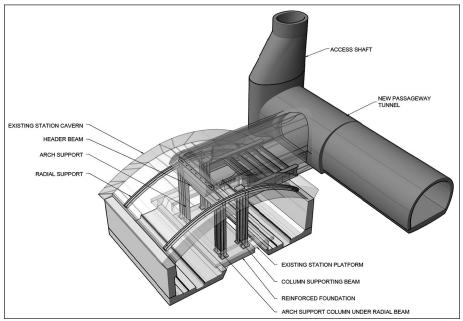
Isometric view of the new passageway tunnel, station connection and access shaft
